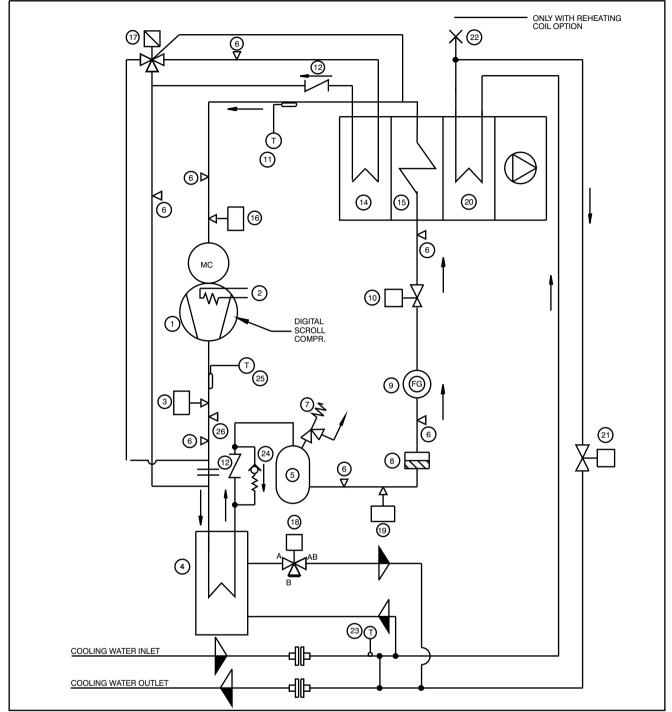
Refrigerant circuit F version - Single circuit - Single DIGITAL SCROLL compressor - TXV
